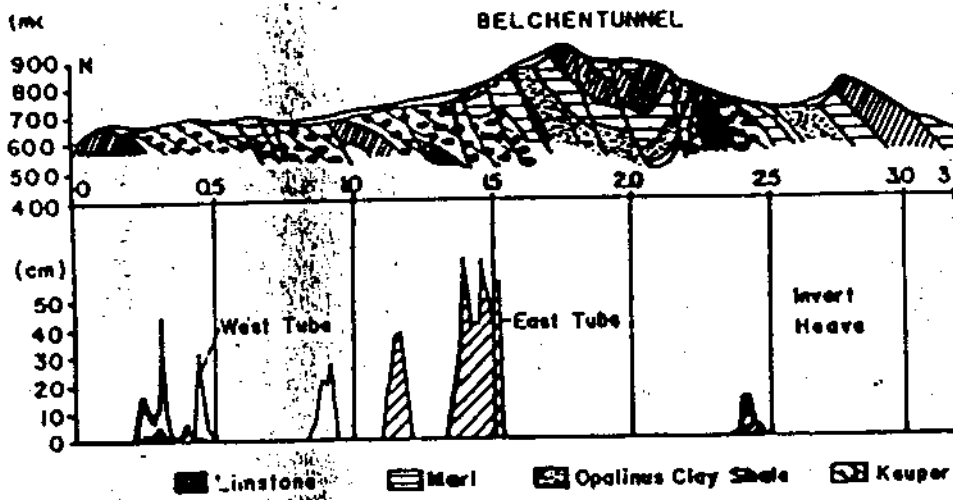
Belchen Tunnel: Longitudinal cross section and invert heave (from: Crob, 1972).
